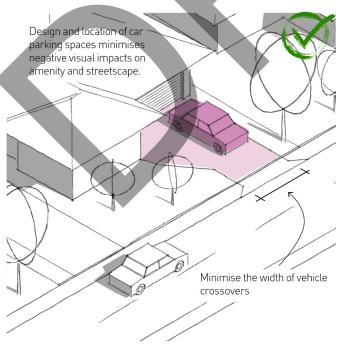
Single House and Grouped Dwellings - Setback of Garages and Carports Example Diagram
